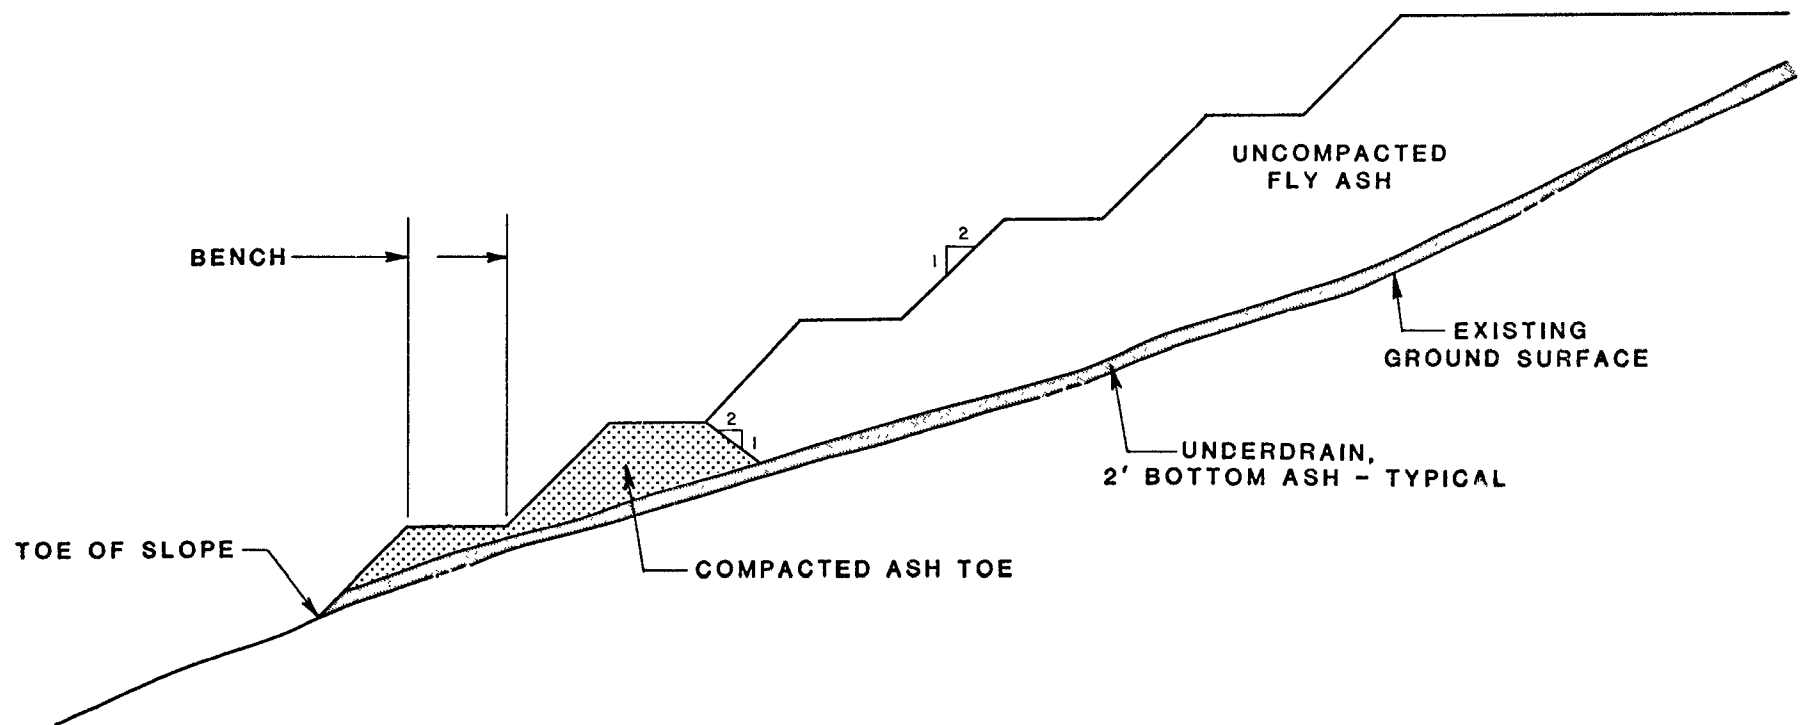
CROSS-SECTION : DRY ASH DISPOSAL AREA
